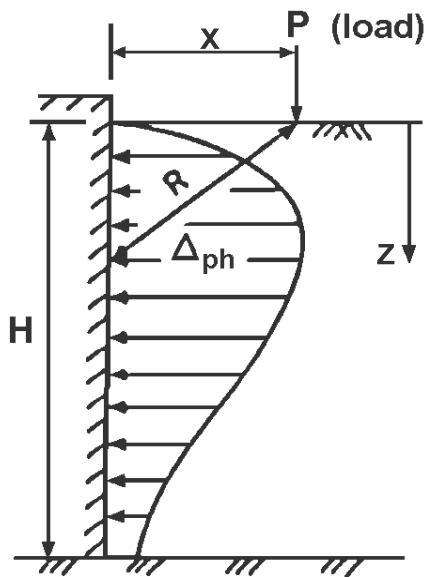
Horizontal Pressure on a Wall Caused by a Point Load
